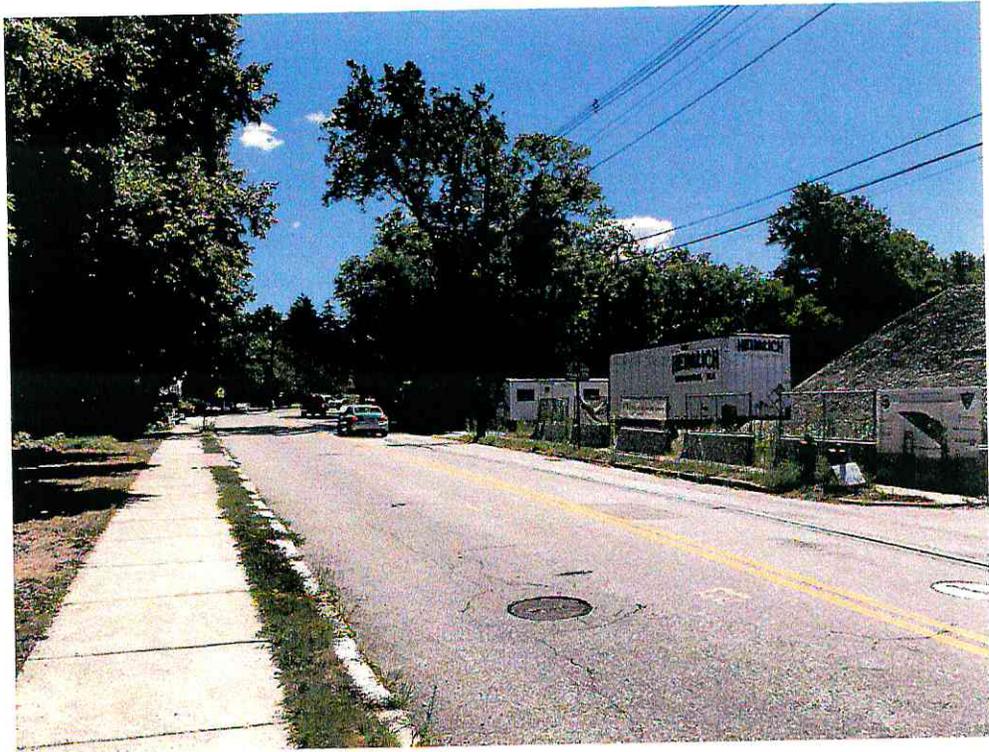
Location Q – Cross St. looking east. 115' east of MBTA Bridge.
